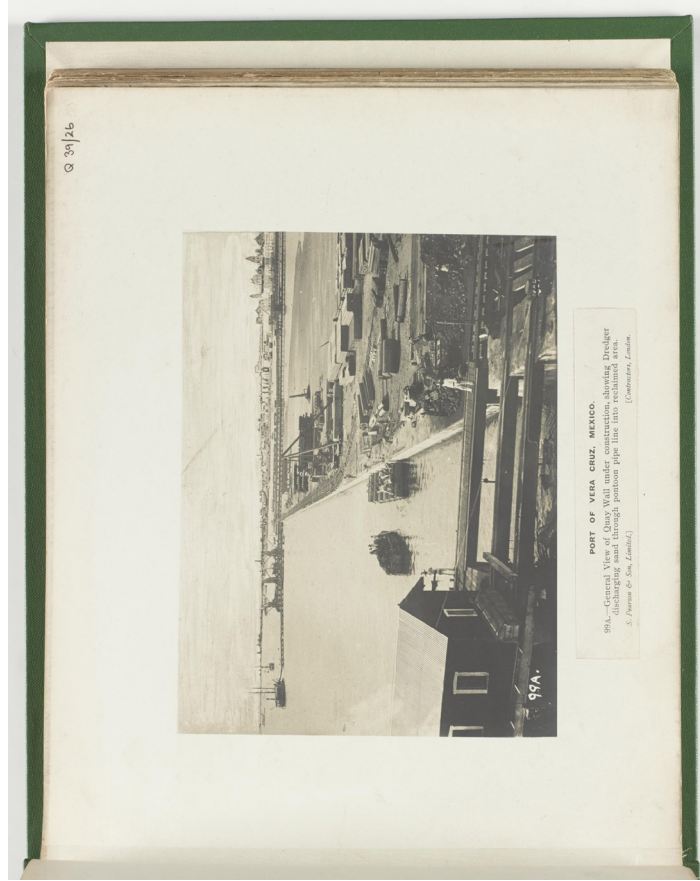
Unknown author, “General view of quay wall under construction, showing dredger discharging sand through pontoon pipe line into reclaimed area”
